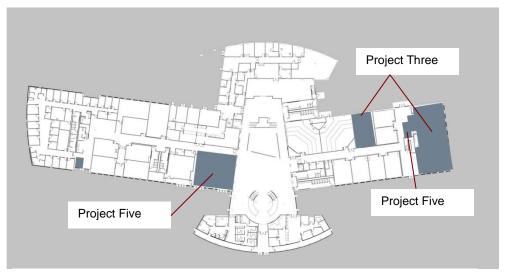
Figure L.Rampart Range Campus Project Implementation Plan, First Floor Main Building. Source: Hall Architects.
